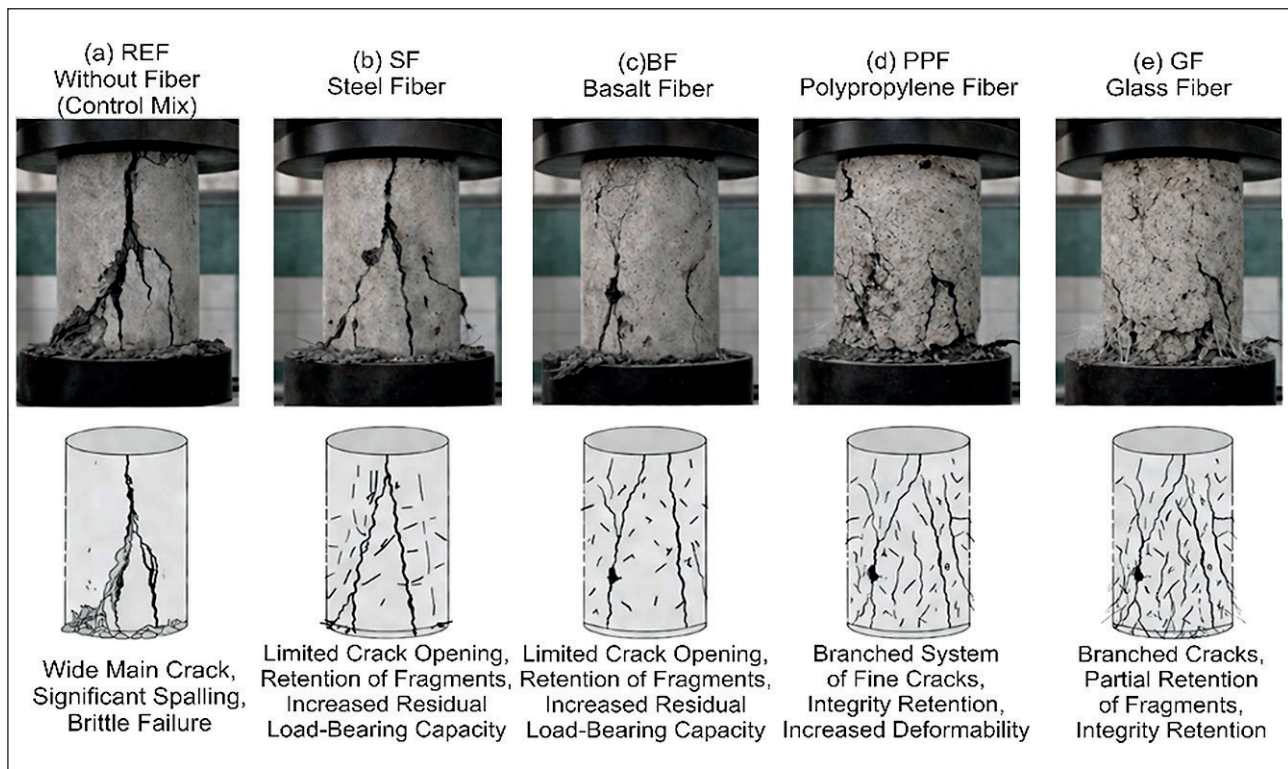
Characteristic failure patterns of cylindrical concrete specimens under axial compression: a – REF – without fiber; b – SF – steel fiber; c – BF – basalt fiber; d – PPF – polypropylene fiber; e – GF – glass fiber
